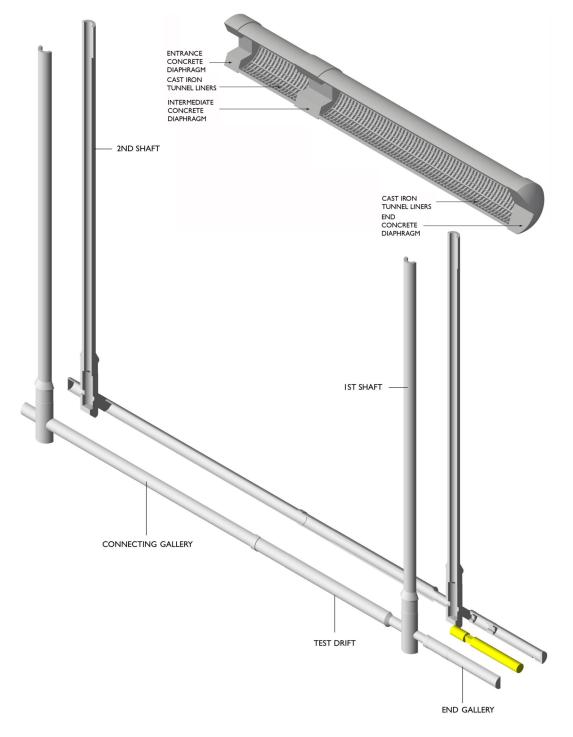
Cutaway Illustrations of the Underground Existing Tunnel System
